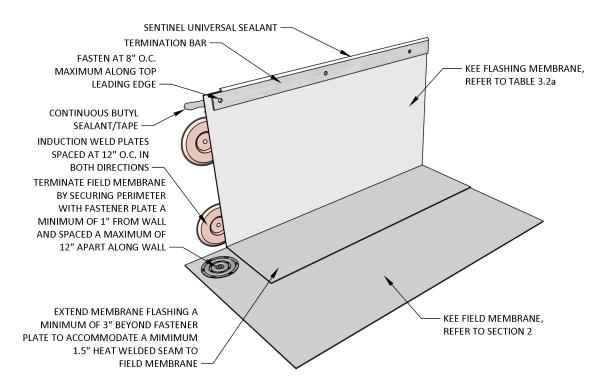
Induction Welded KEE Flashing Membrane at Wall/Curb with Horizontal Perimeter Fastening
